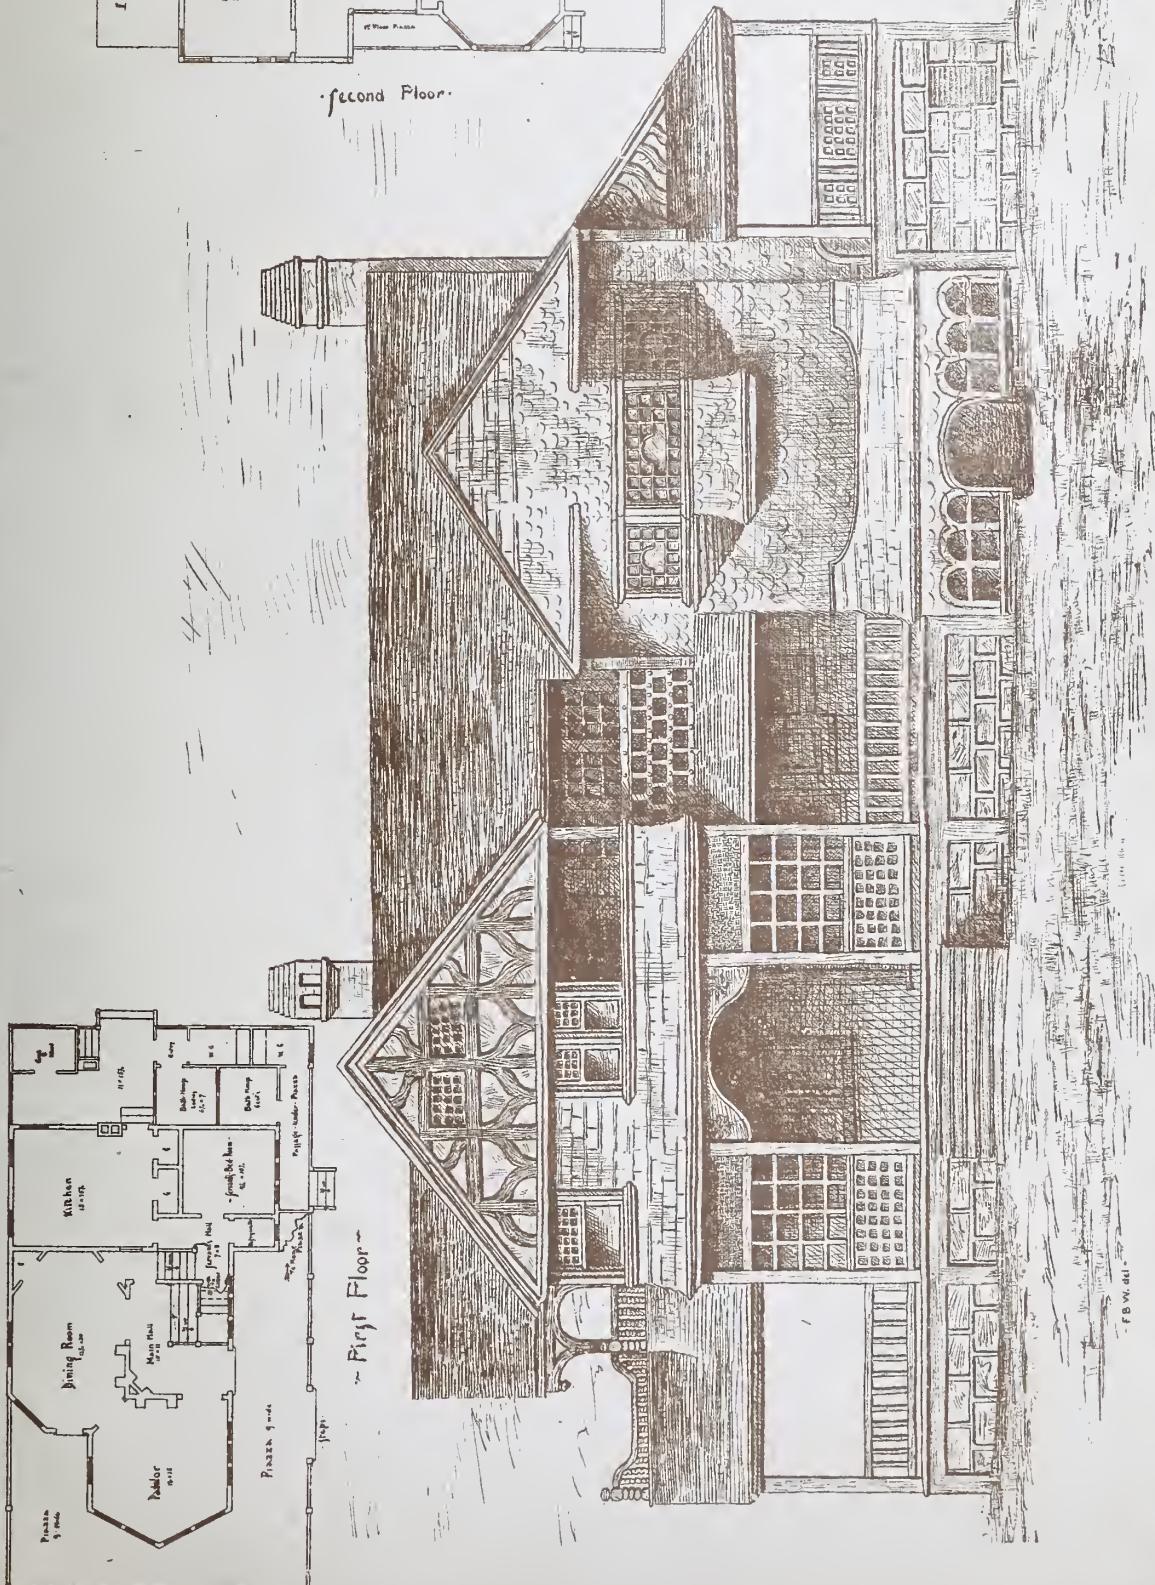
shows the front elevation of a cottage designed by David S. Hopkins, architect, Grand Rapids;
